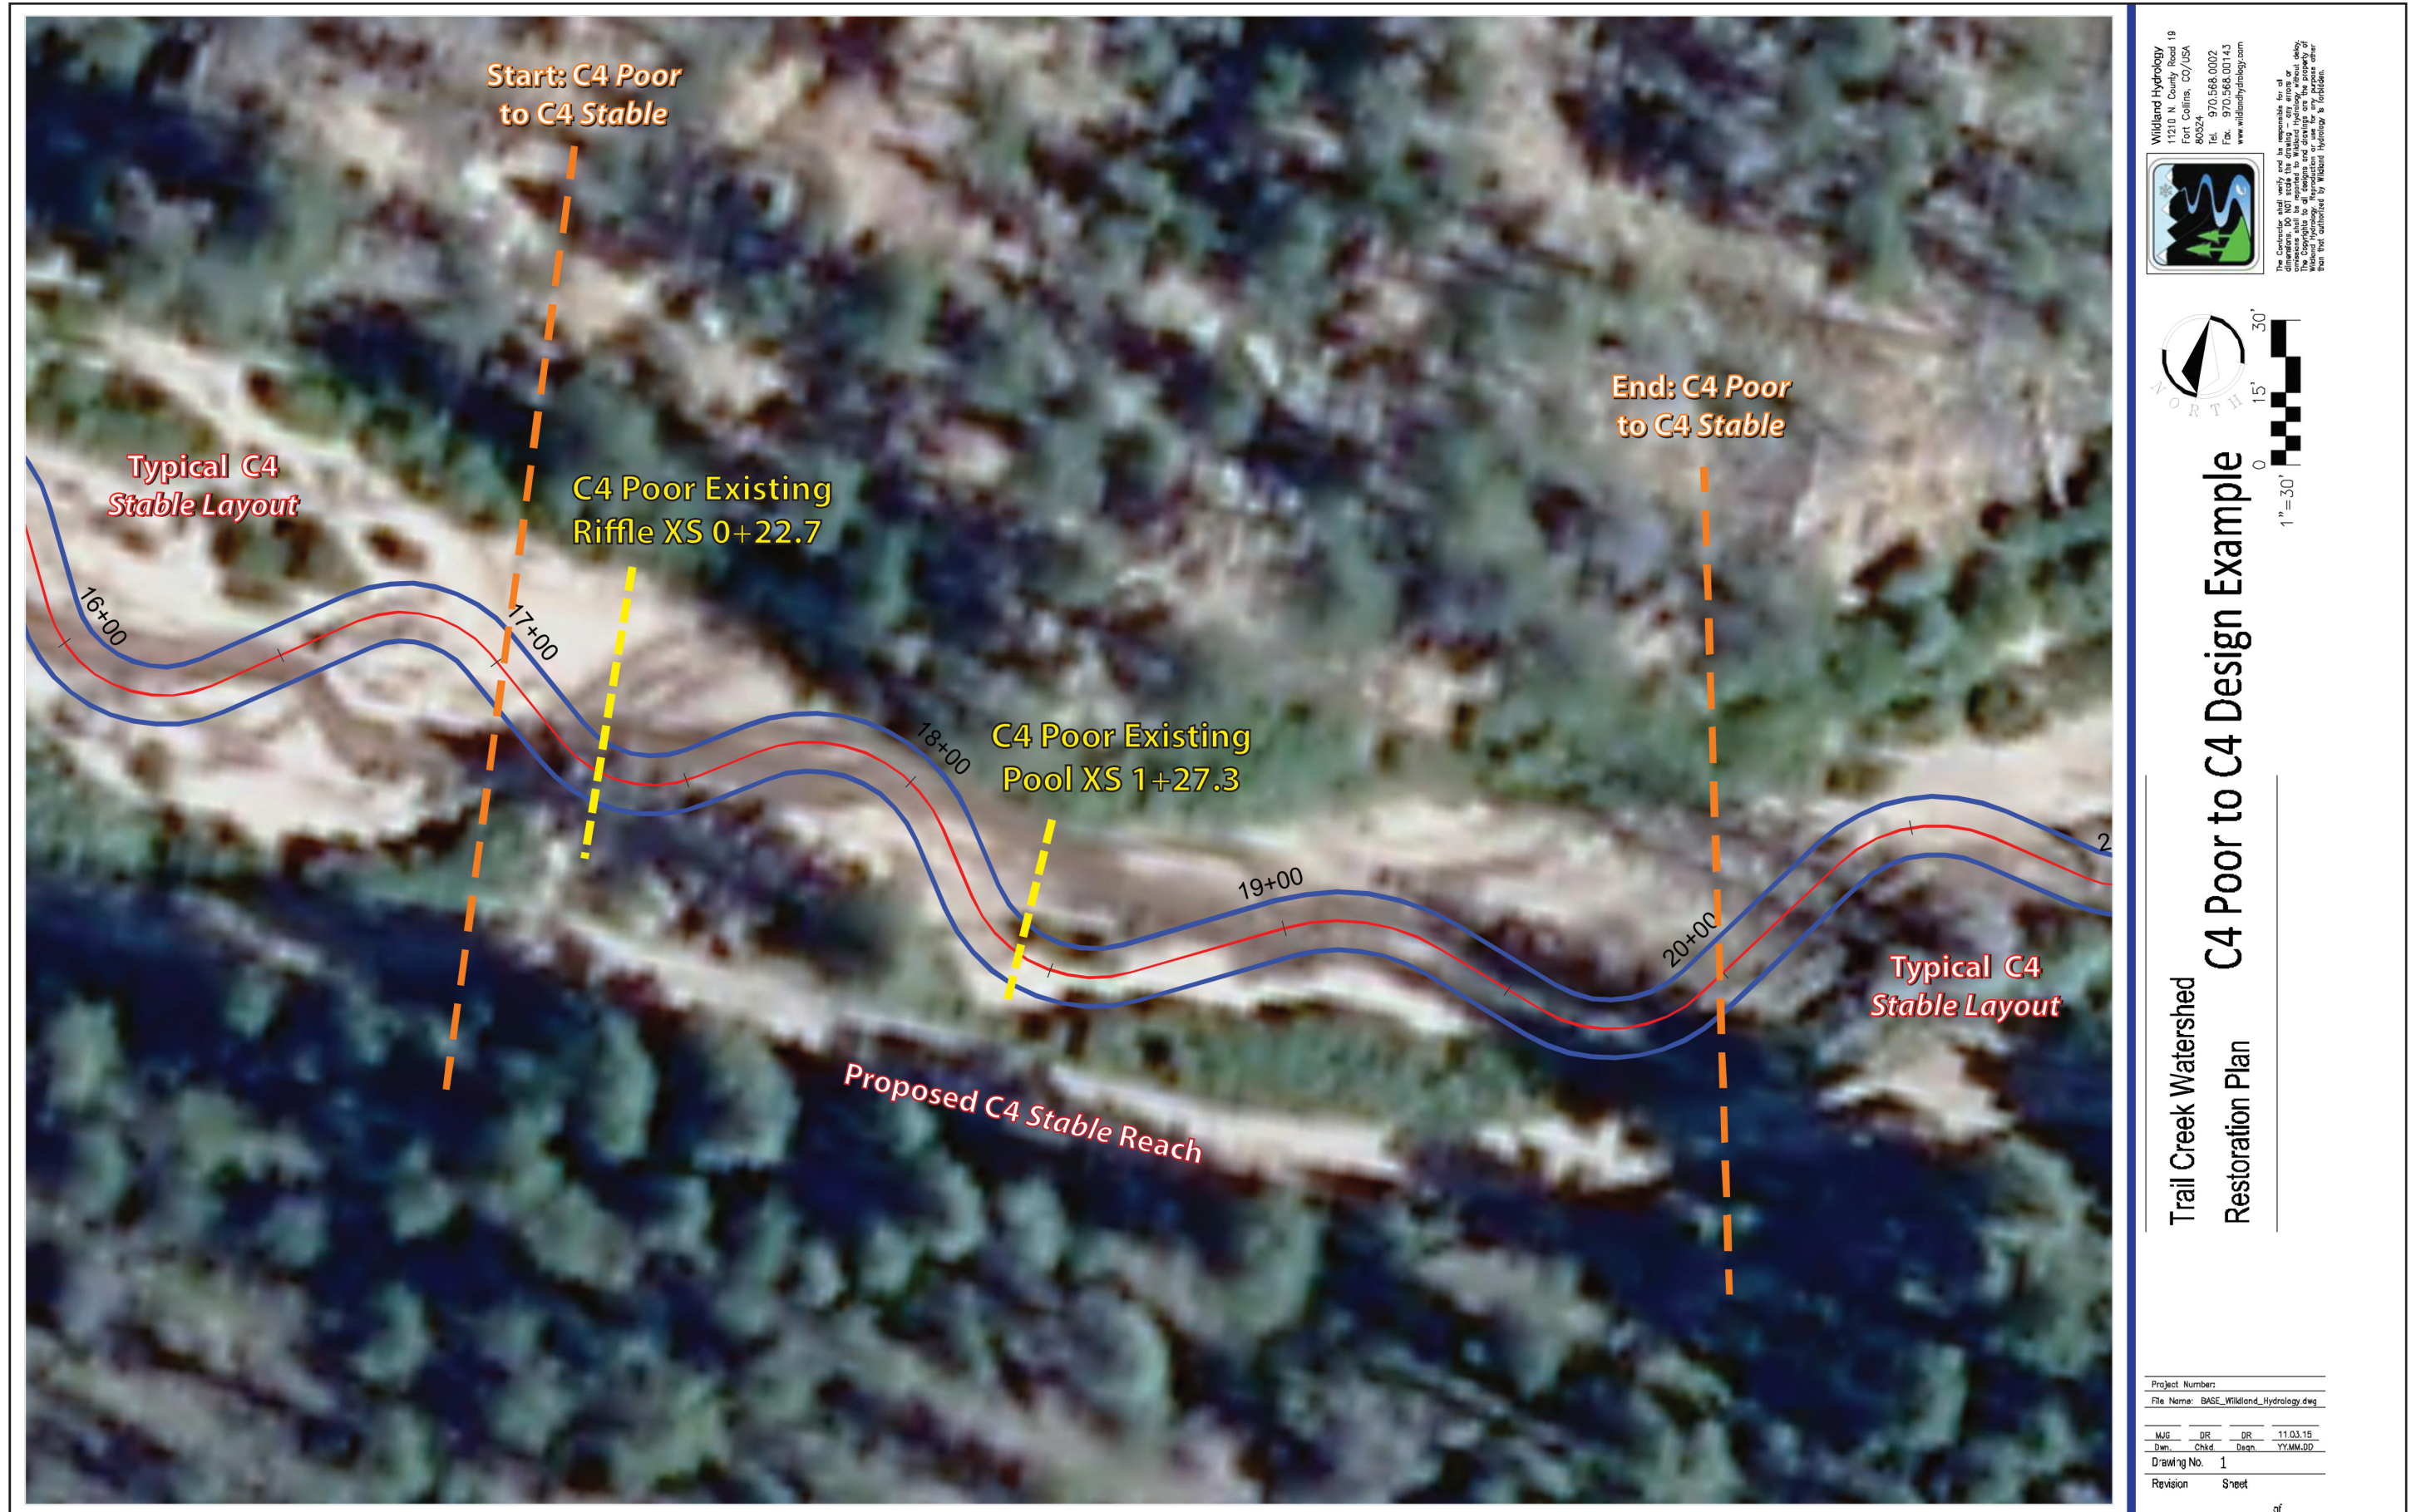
Plan view of the alignment for the proposed C4 Stable stream type, including the existing cross-section locations of the C4 Poor condition stream type.
